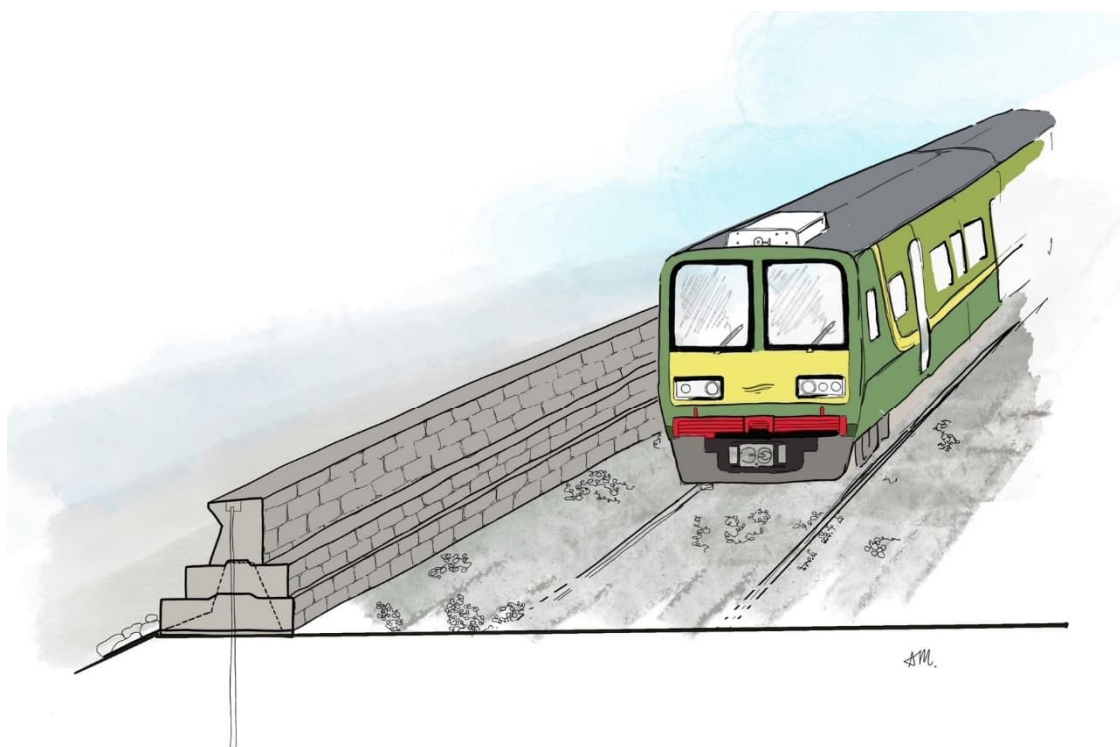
Illustrative sketch of the new concrete wave wall at Merrion
